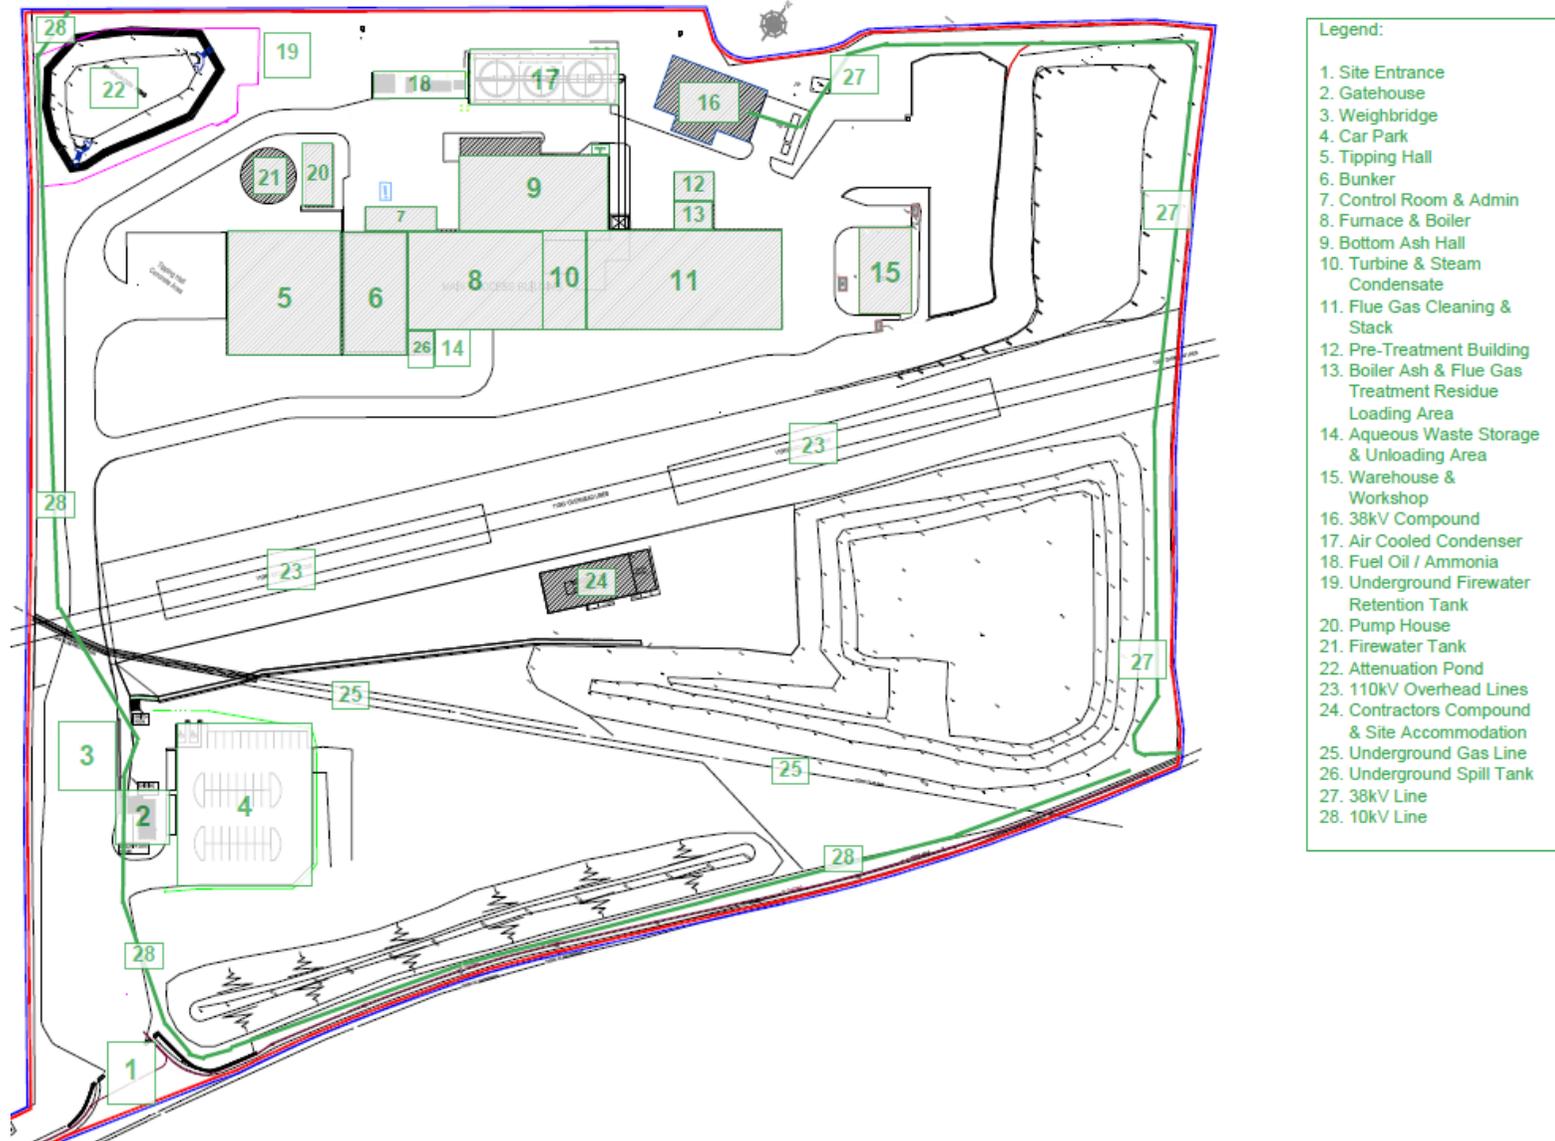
Existing Indaver Site Layout. Not to scale.
